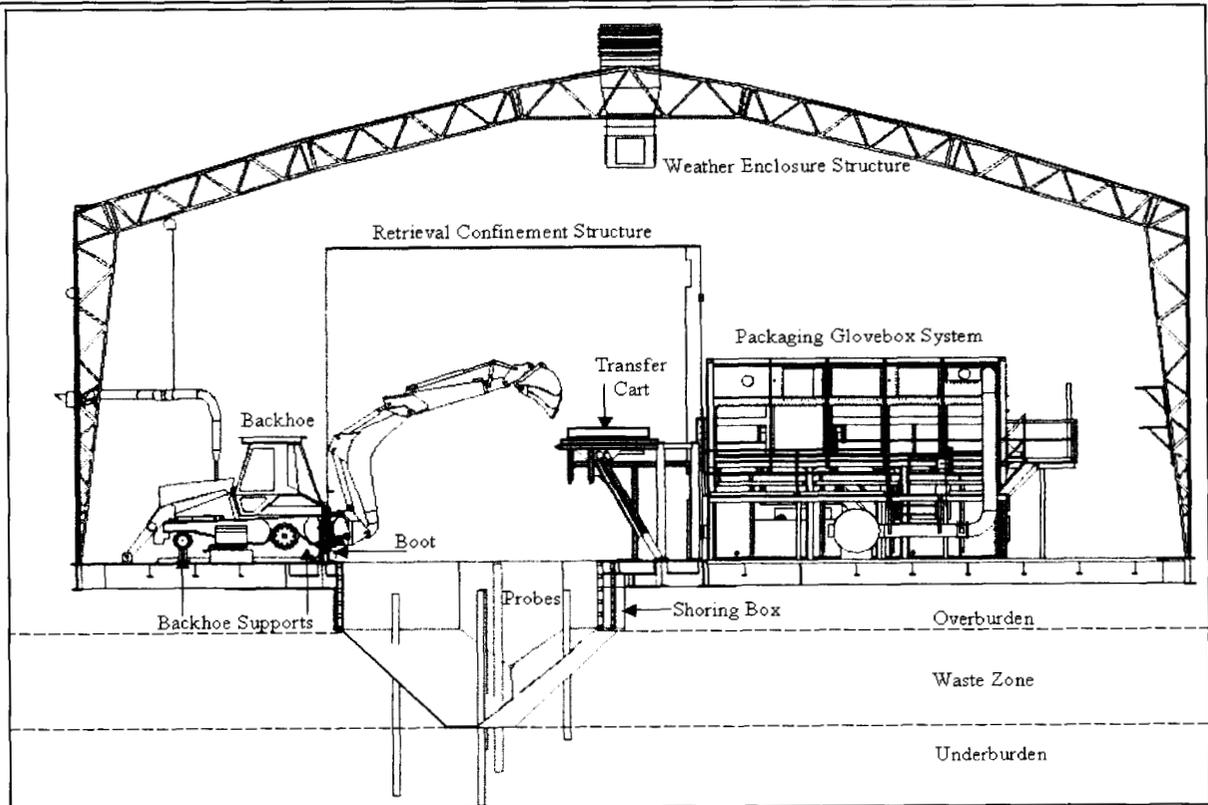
Cross section of the Glovebox Excavator Method Project facility.
